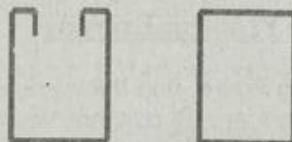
OPEN AND CLOSED STIRRUPS
